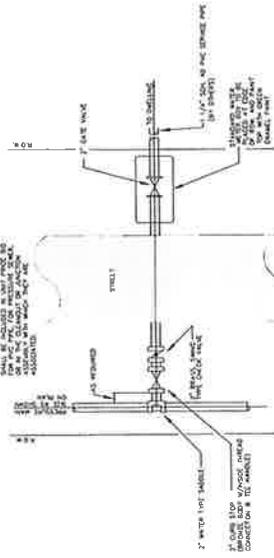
DETAIL FOR CONNECTING TO EXISTING FORCE MAIN
